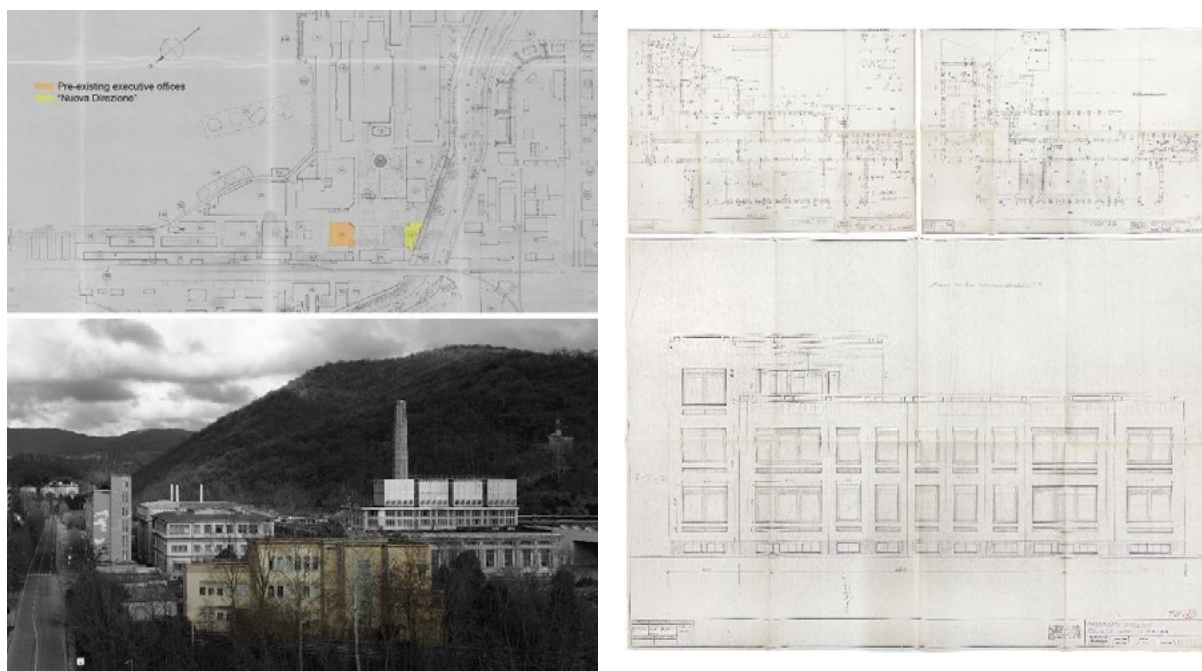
On the left, General plan's detail extracted from the general site plan of the factory (AFFM, s.d.: Drawing 511666, *Planimetria generale dello stabilimento. Situazione dopo lo sbancamento del 1962*, Scale 1:1000, 1 May 1966; Courtesy of Ferrania Film Museum), showing the “Nuova Direzione” building and the pre-existing office building known as “Vecchia Direzione”. Below, view of the factory (photo by Land-In-Pro, 2024, CC BY-NC 4.0). On the right, Ground floor plan (AFFM, D08; fasc. f97, Drawing 411159, Scale 1:50, 16 July 1955), first floor plan (AFFM, D08; fasc. f97, Drawing 411160, Scale 1:50, 15 July 1955), Elevation facing the inner courtyard (AFFM, D08; fasc. f97, Drawing 411117, Scale 1:50, 9 October 1954). Courtesy of Ferrania Film Museum.
